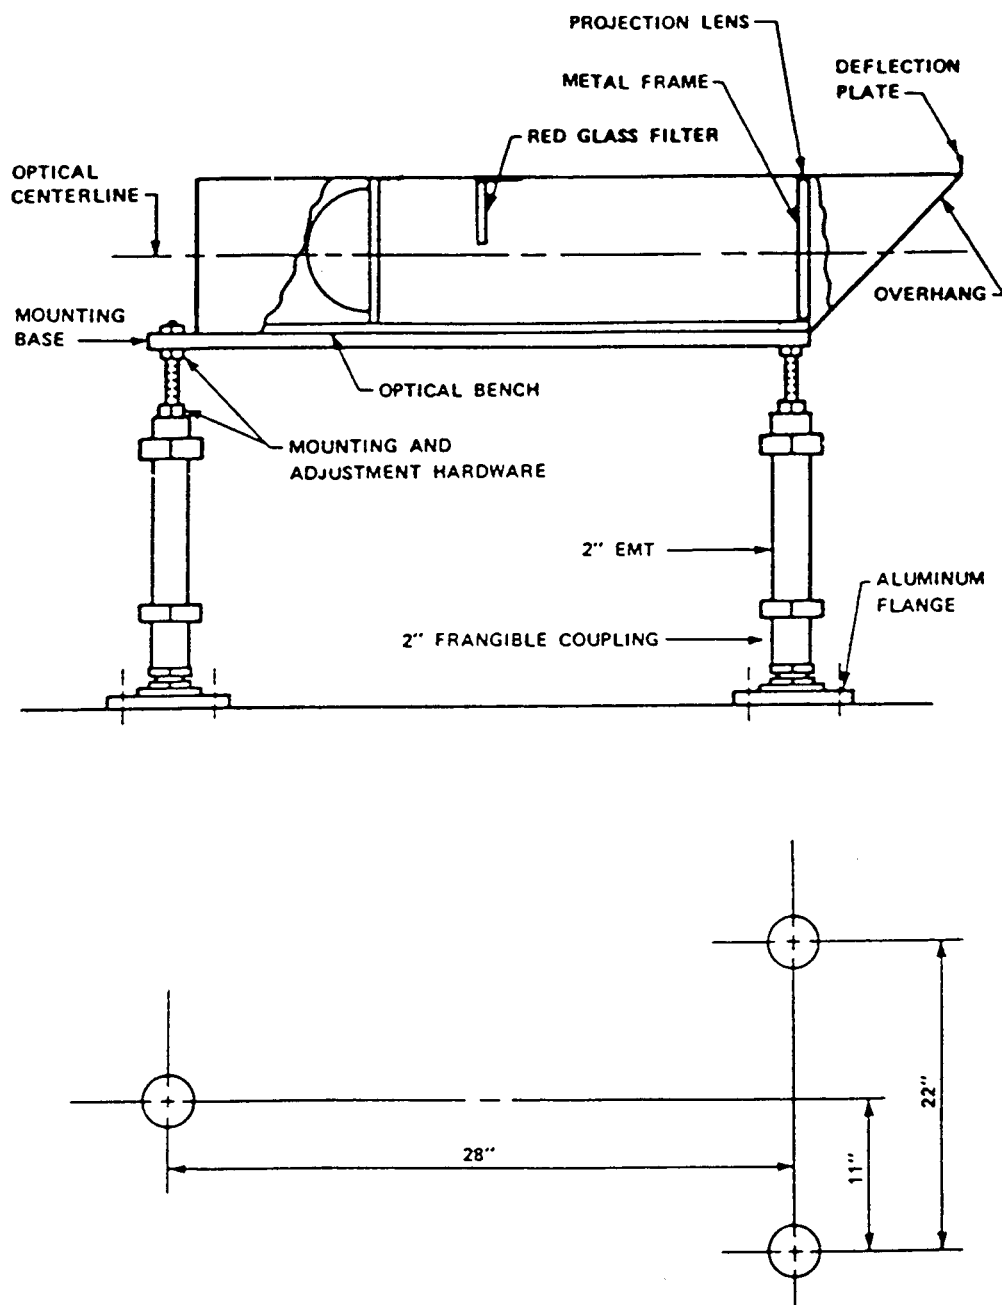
LAMP HOUSING ASSEMBLY (SIDE VIEW)
